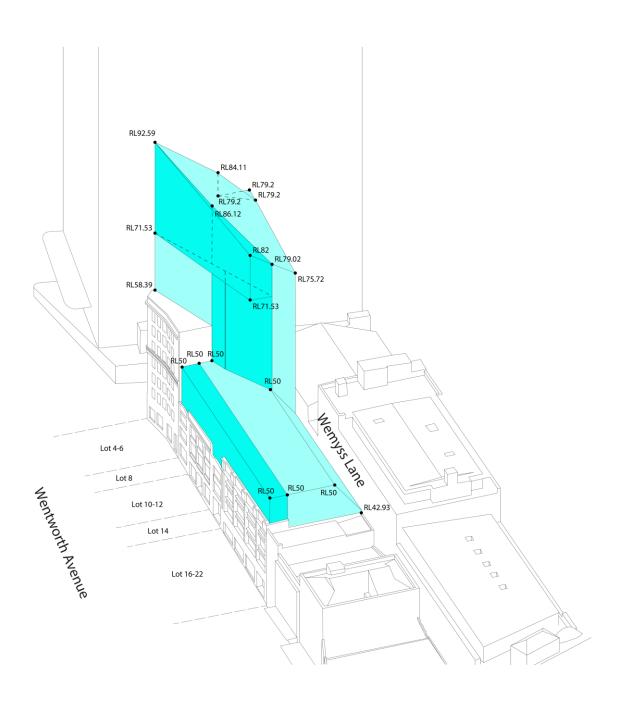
xxx: 4-22 Wentworth Avenue – Maximum planning envelope plan Note: design excellence shown in darker blue
